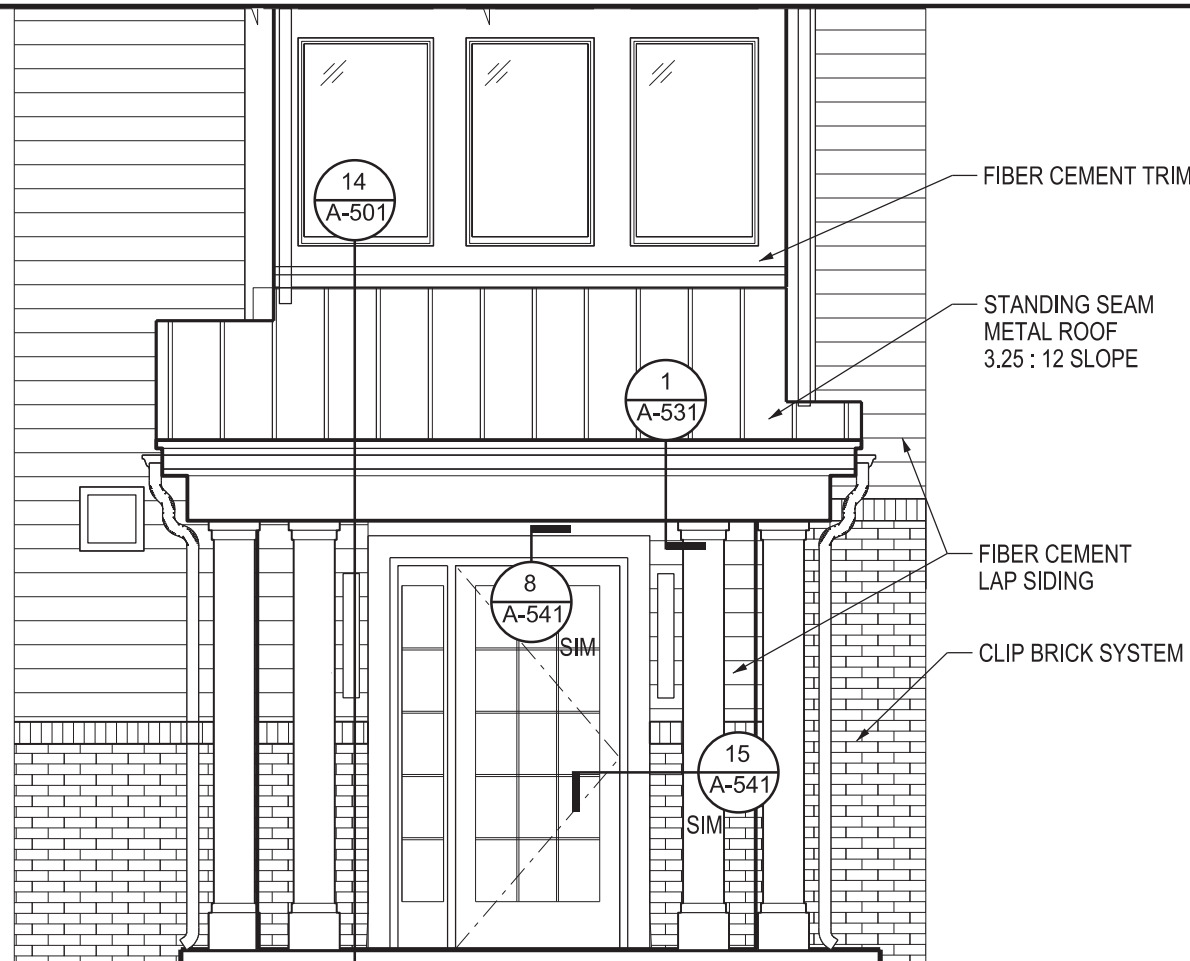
EXHIBIT E - ARCHITECTURAL RENDERINGS - TYPICAL REAR ELEVATION
